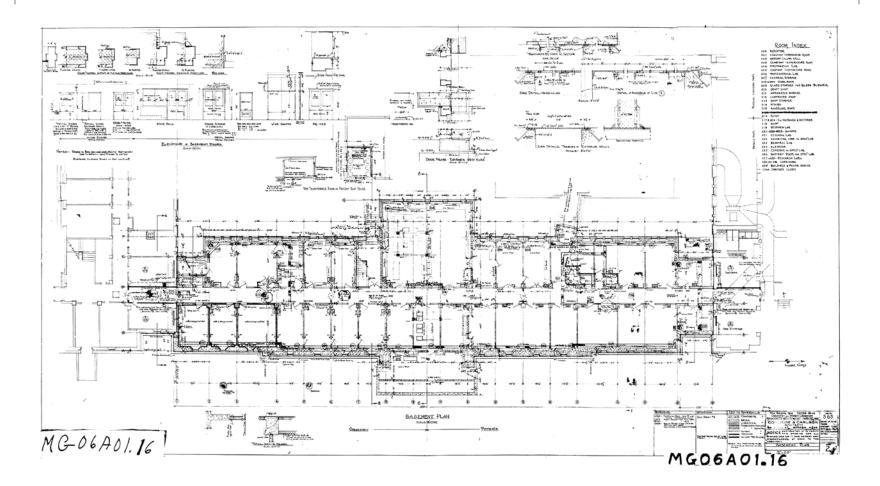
Basement Plan. The connection with the Spectroscopy Laboratory at the top right corner is discerned.
